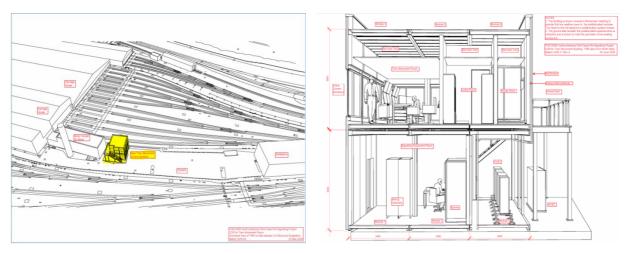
NPD Proposed location (highlighted) of the new facility and interior layout view
